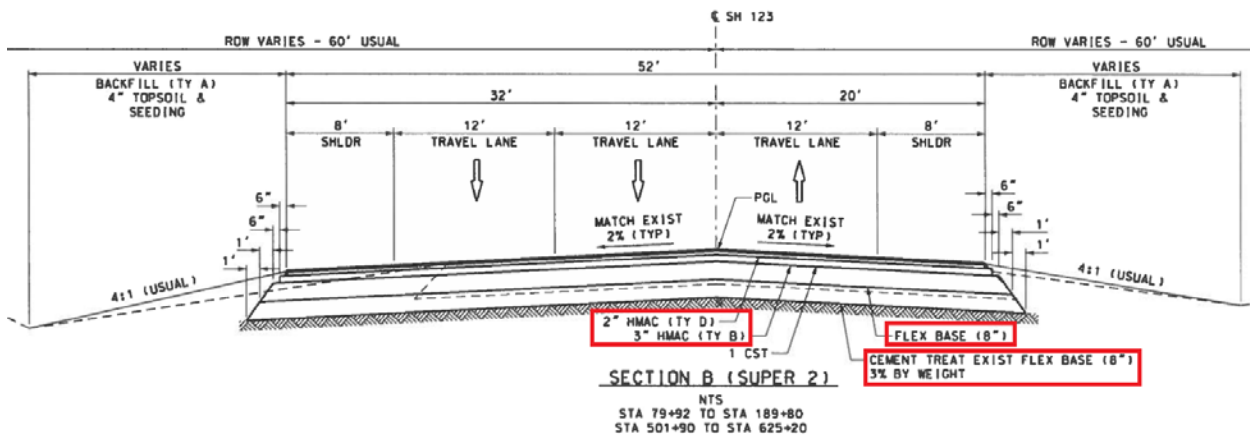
Pavement Construction Section and View of SH-123 in Corpus Christi.
